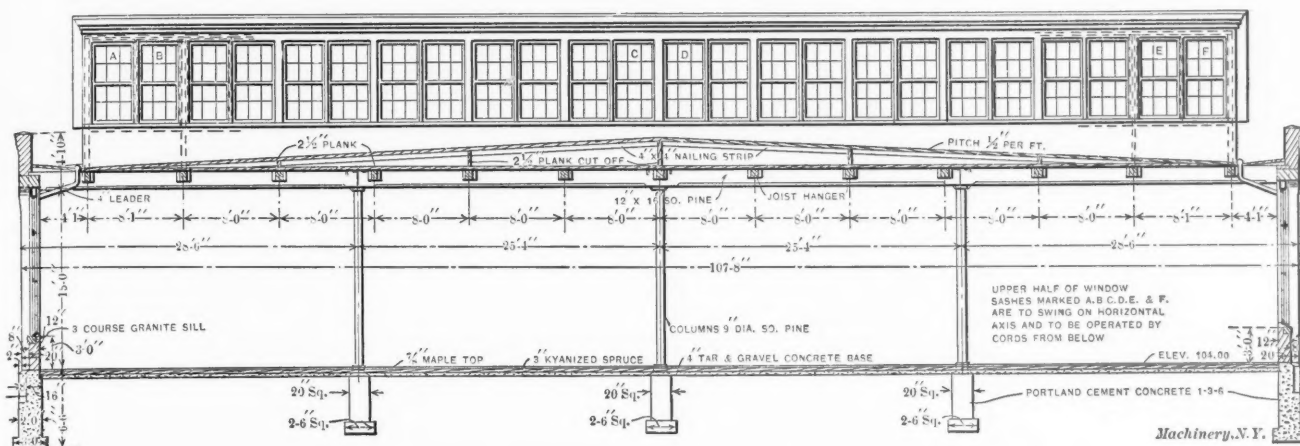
Section through Building having Vertical Saw-tooth Roof
